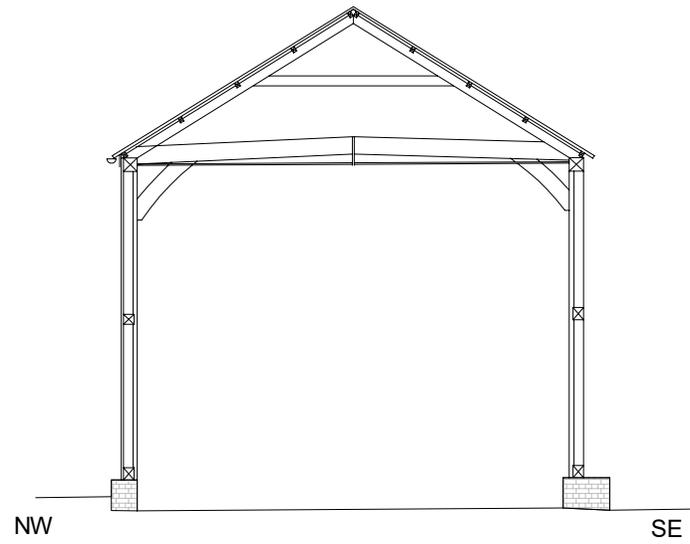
Truss cross-section from threshing barn A, between bays 3 and 4.
